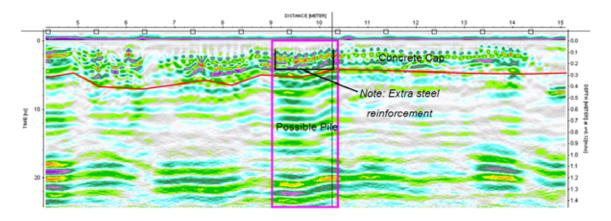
Sample radar-gram from Area 1 showing a possible pile (highlighted in pink). Note the extra steel reinforcement found in the concrete cap relating to the pile.
